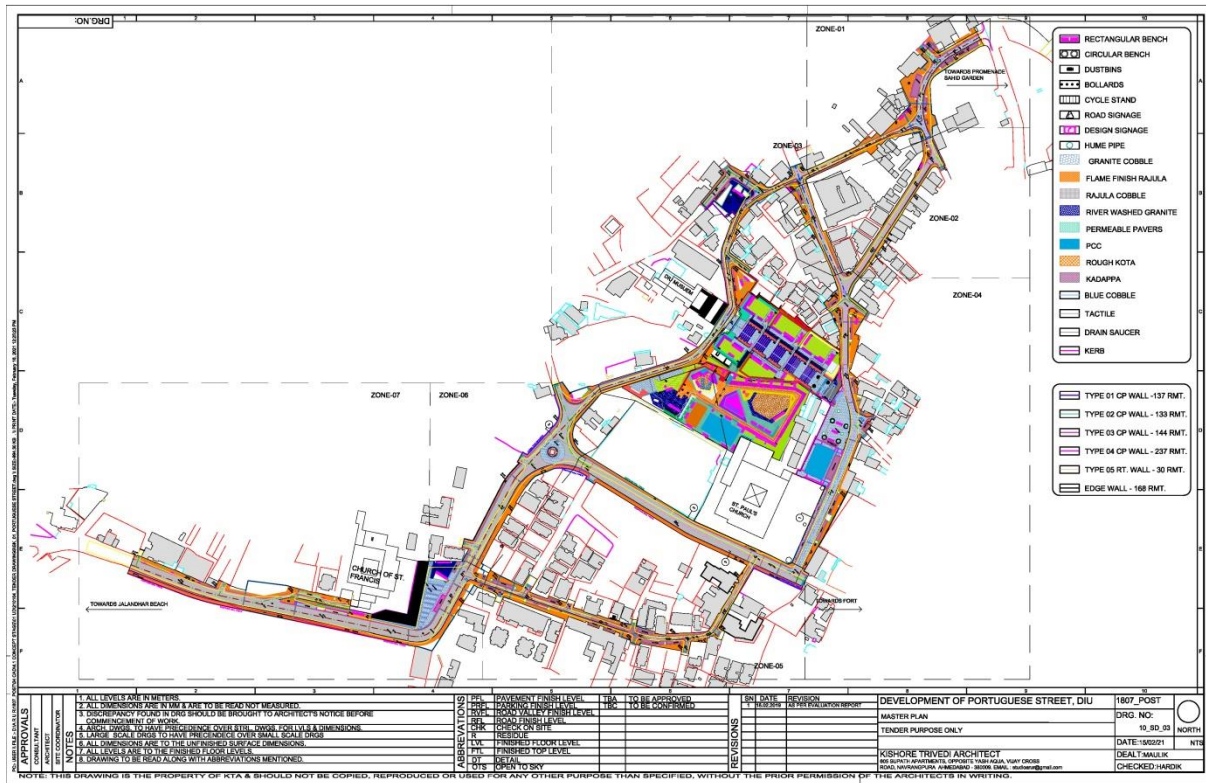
Portuguese Street – Proposed Master Plan with Zoning
